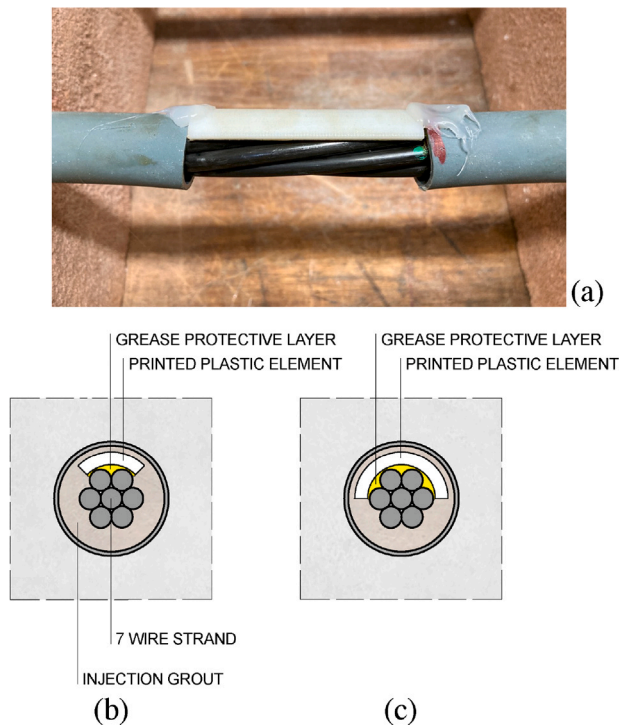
Realisation of specimen defects: (a) Photo of the plastic cap and the protection pipe; (b) Cross section with defect 25%; (c) Cross section with defect 50%.
